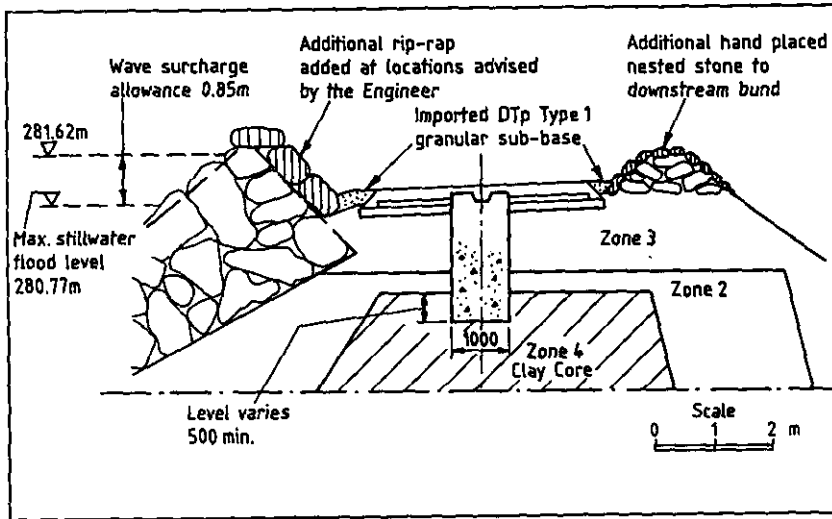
Concrete wall core extension at Llyn Brianne Dam
